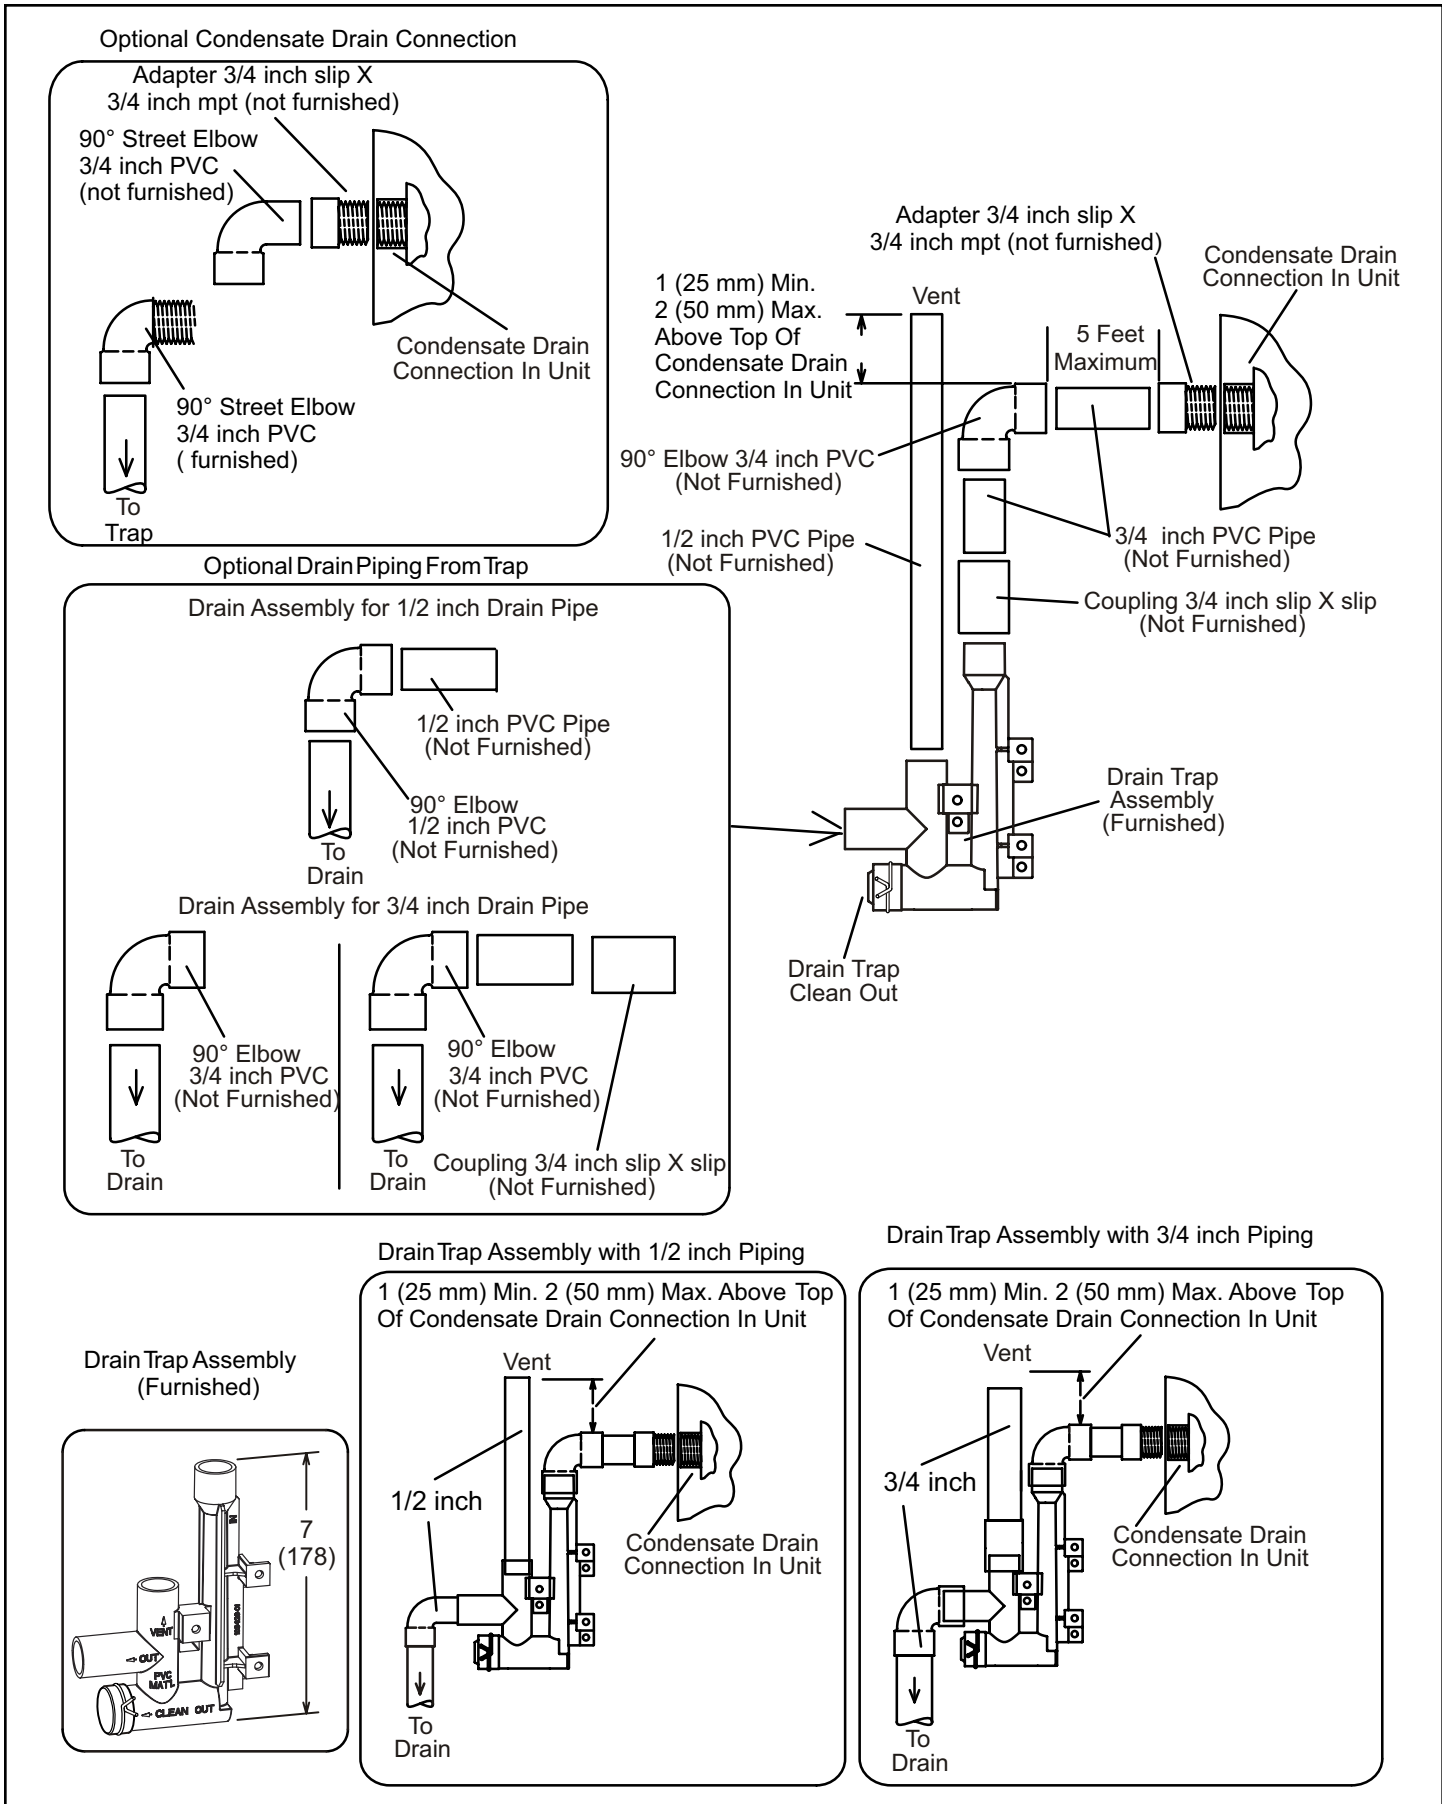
Trap / Drain Assembly Using 1/2" PVC or 3/4" PVC Cold End Header Box with 3/4" Drain Connection
